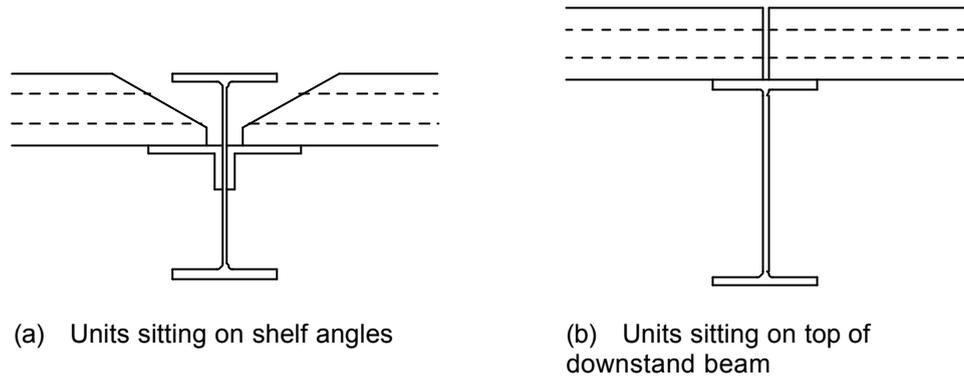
Composite beam and precast concrete unit – typical cross-sections
